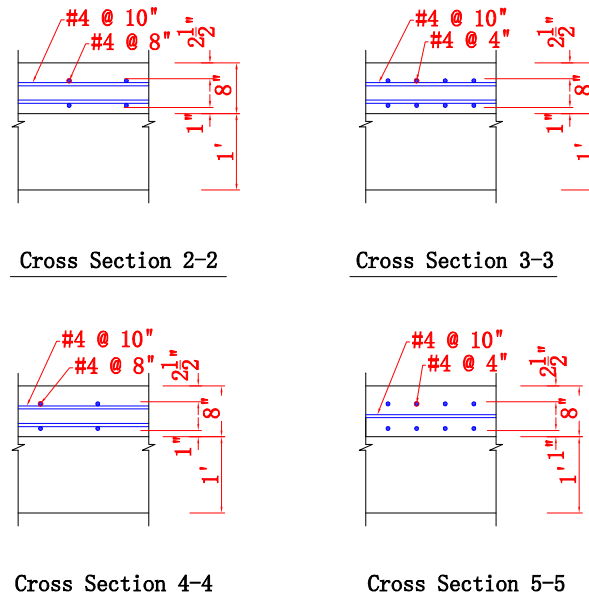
Proposed detail for NEXT-D bridge joint - part 1
